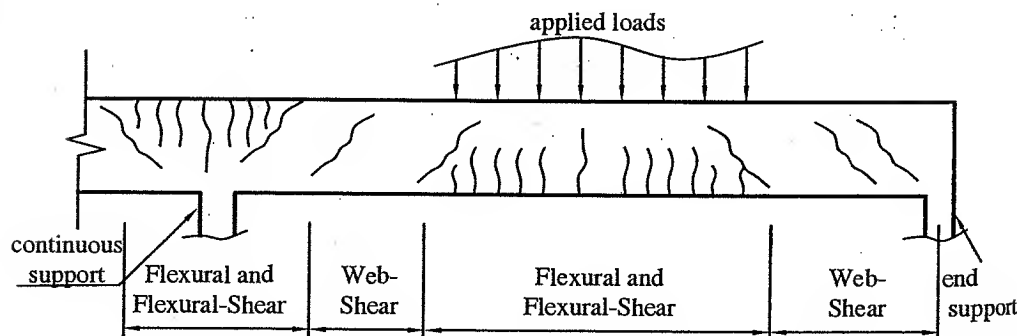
Type of cracking in prestressed concrete beams
